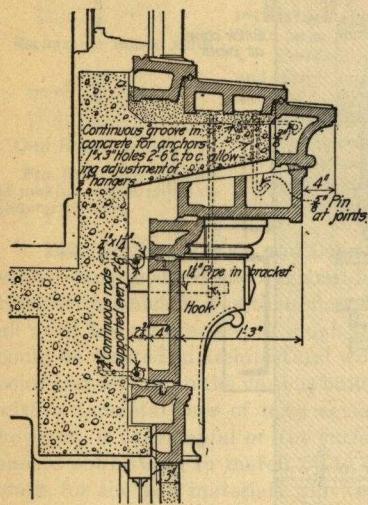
Section through lintel, cornice, and sill in connection with concrete construction.
